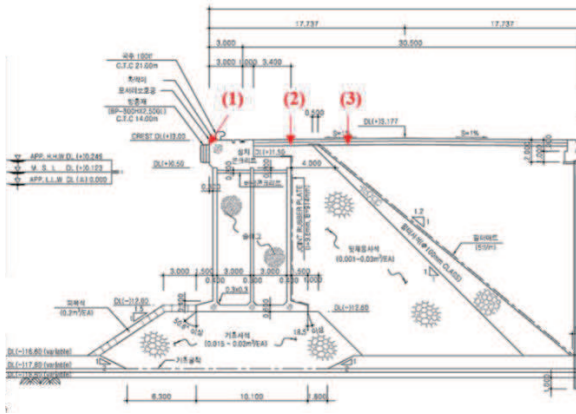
Cross-section of caisson quay wall in Youngil Bay Port (MOF, 2018).
